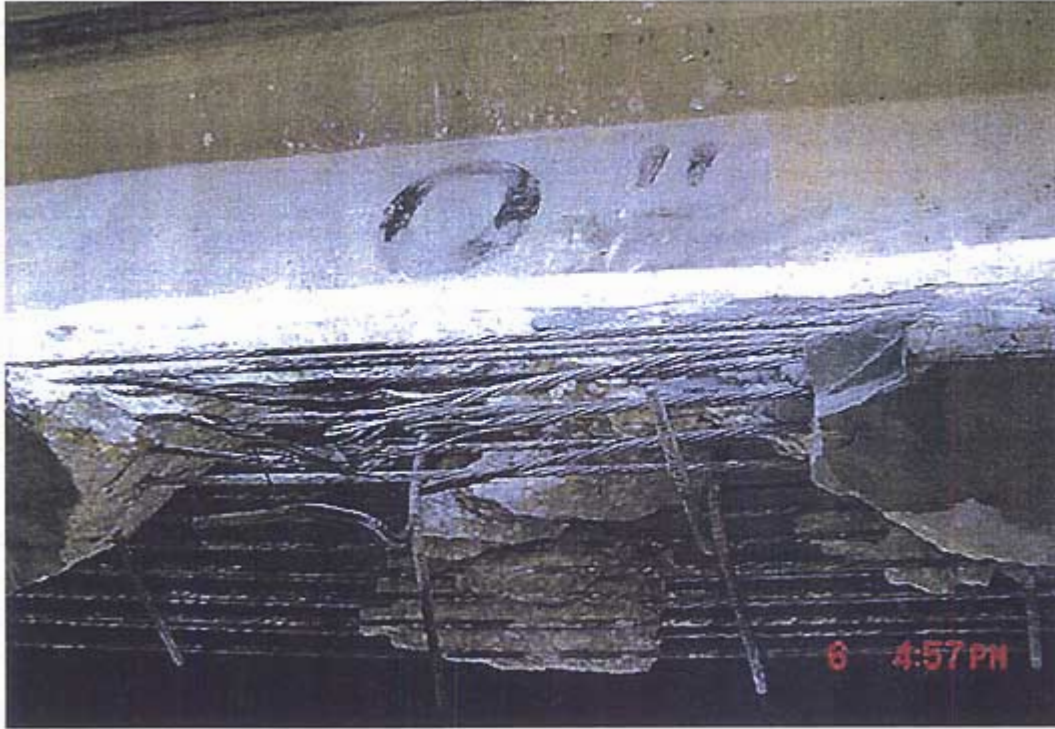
Close-up of Damage on the East Fascia Girder Showing Severed Prestressing Strands
